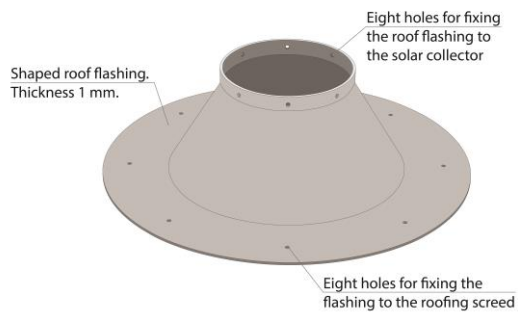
Axonometric view of the flashing that allows anchor the system to the roof slab.
